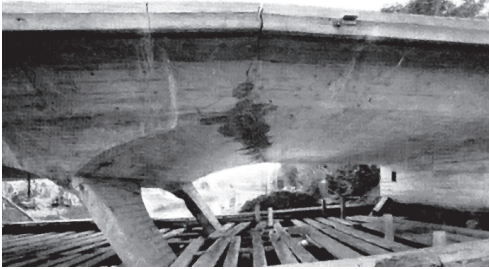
The Glatt Bridge 1 after flexural failure in the end-span (Rösli et al. 1963).
